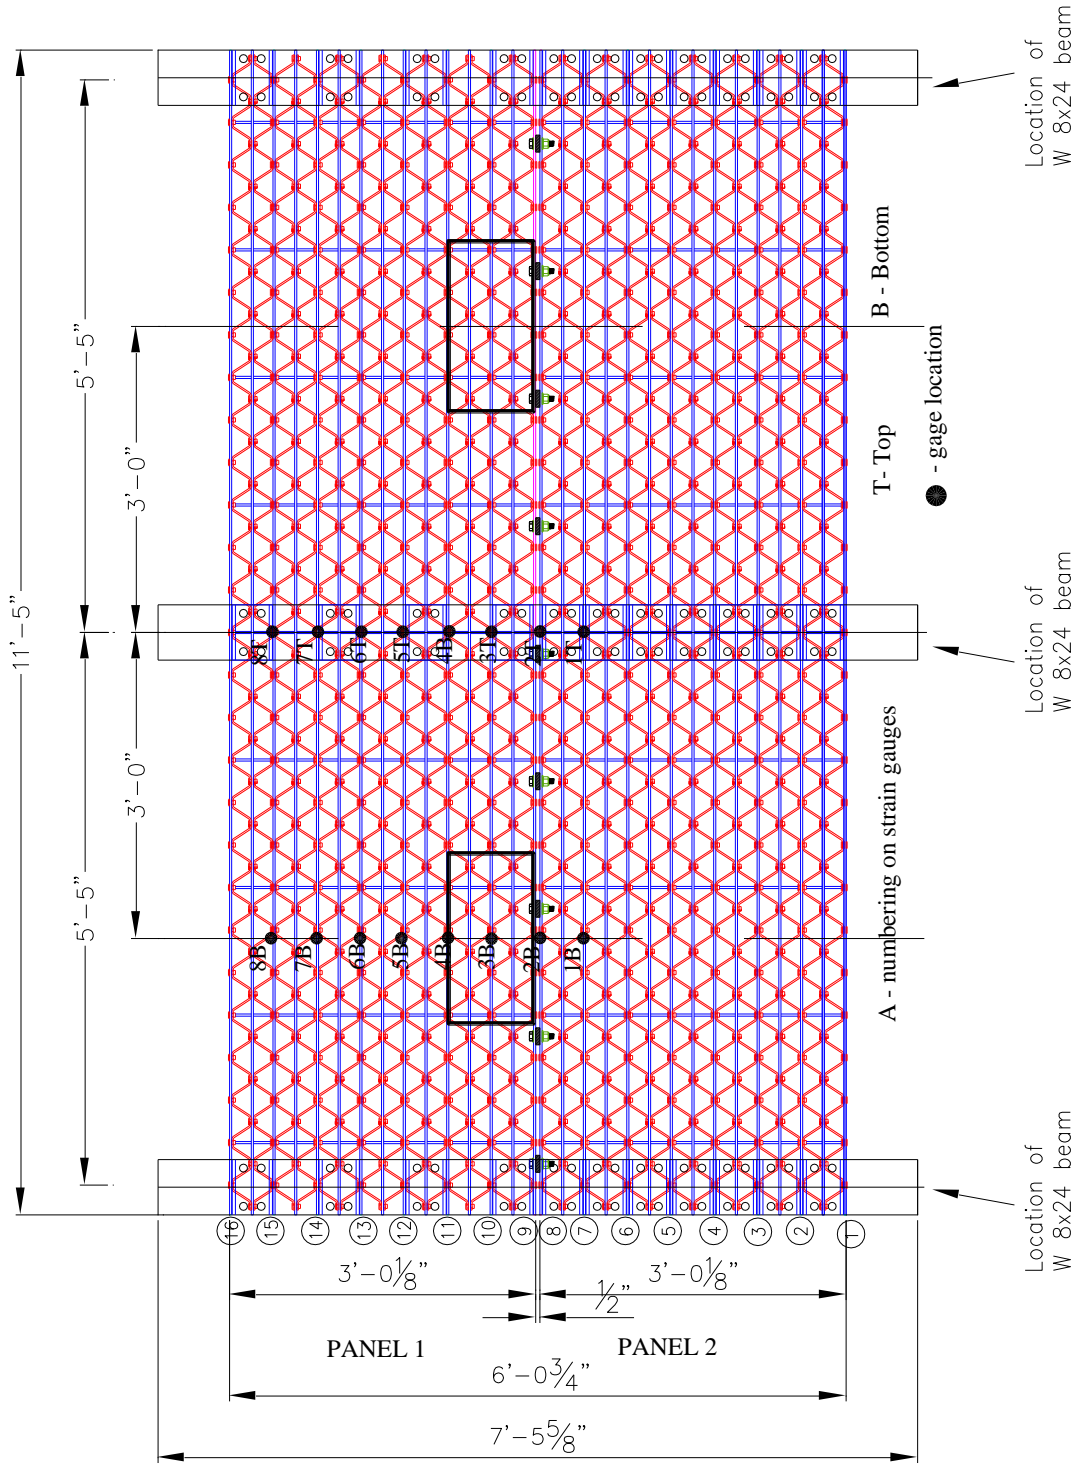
General Arrangement of 37R5-B2 with gage and load positions for test #6
